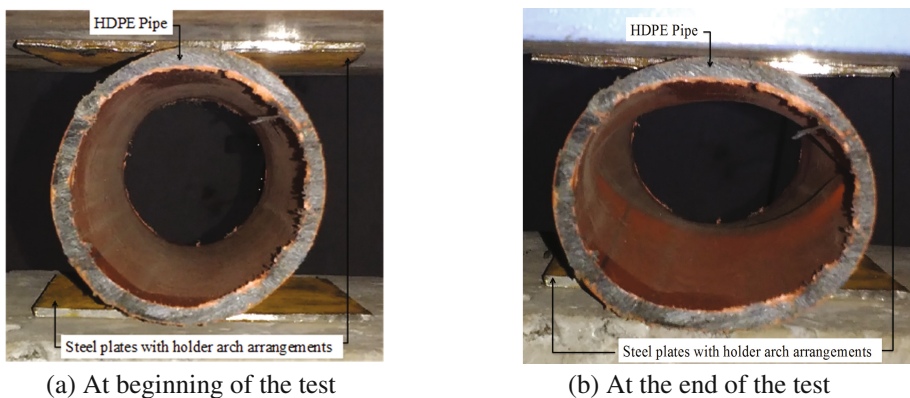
Photograph view of uniaxial compression test on model HDPE pipe
